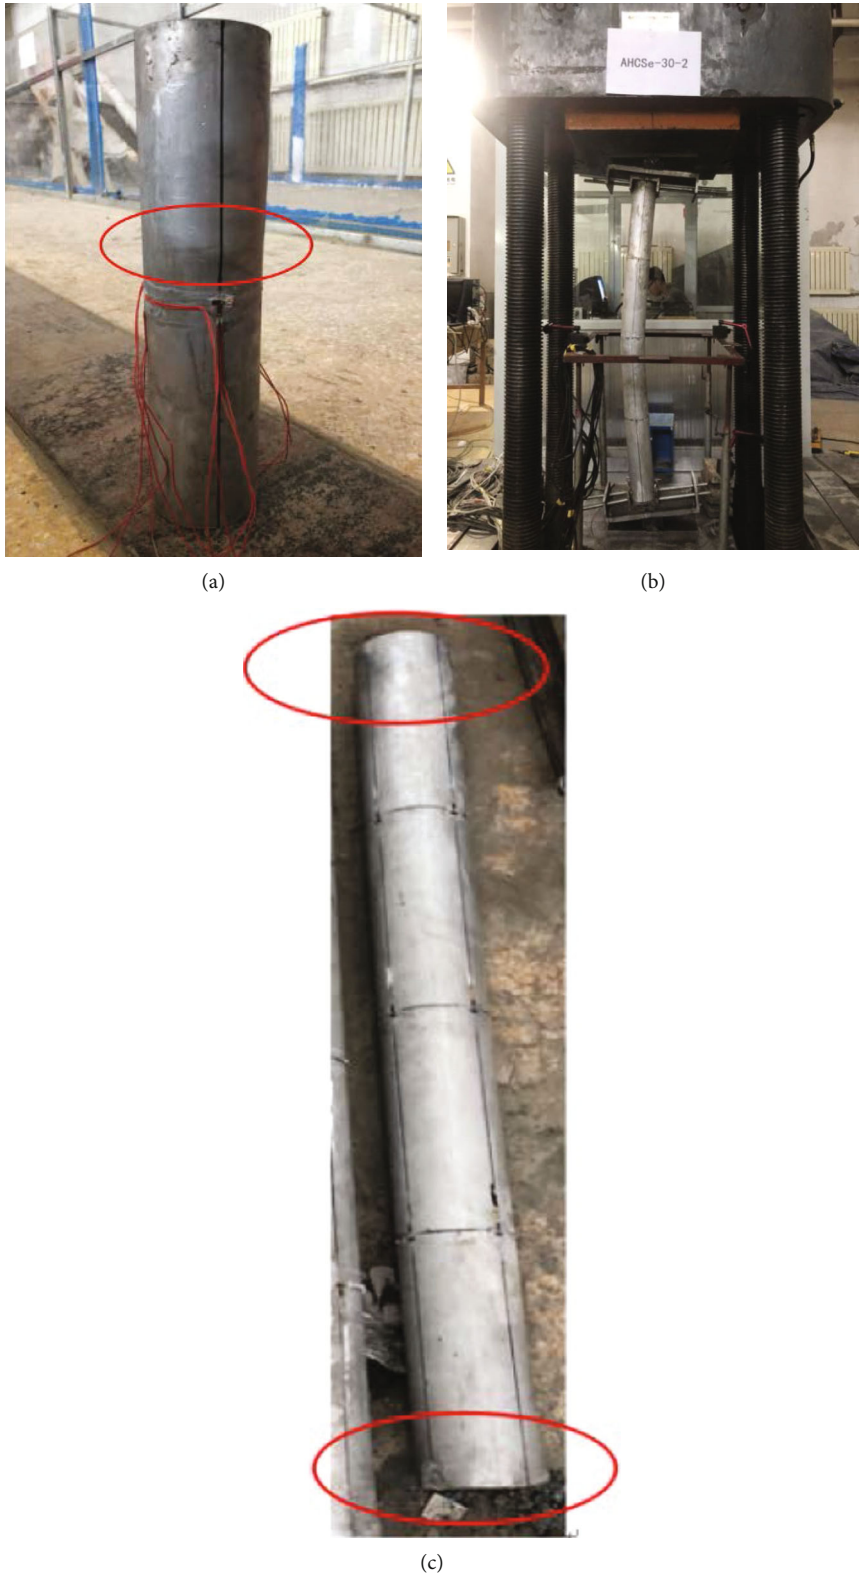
Failure pattern of aluminum alloy concrete columns: (a) central swelling failure; (b) midspan bend; (c) end failure.
